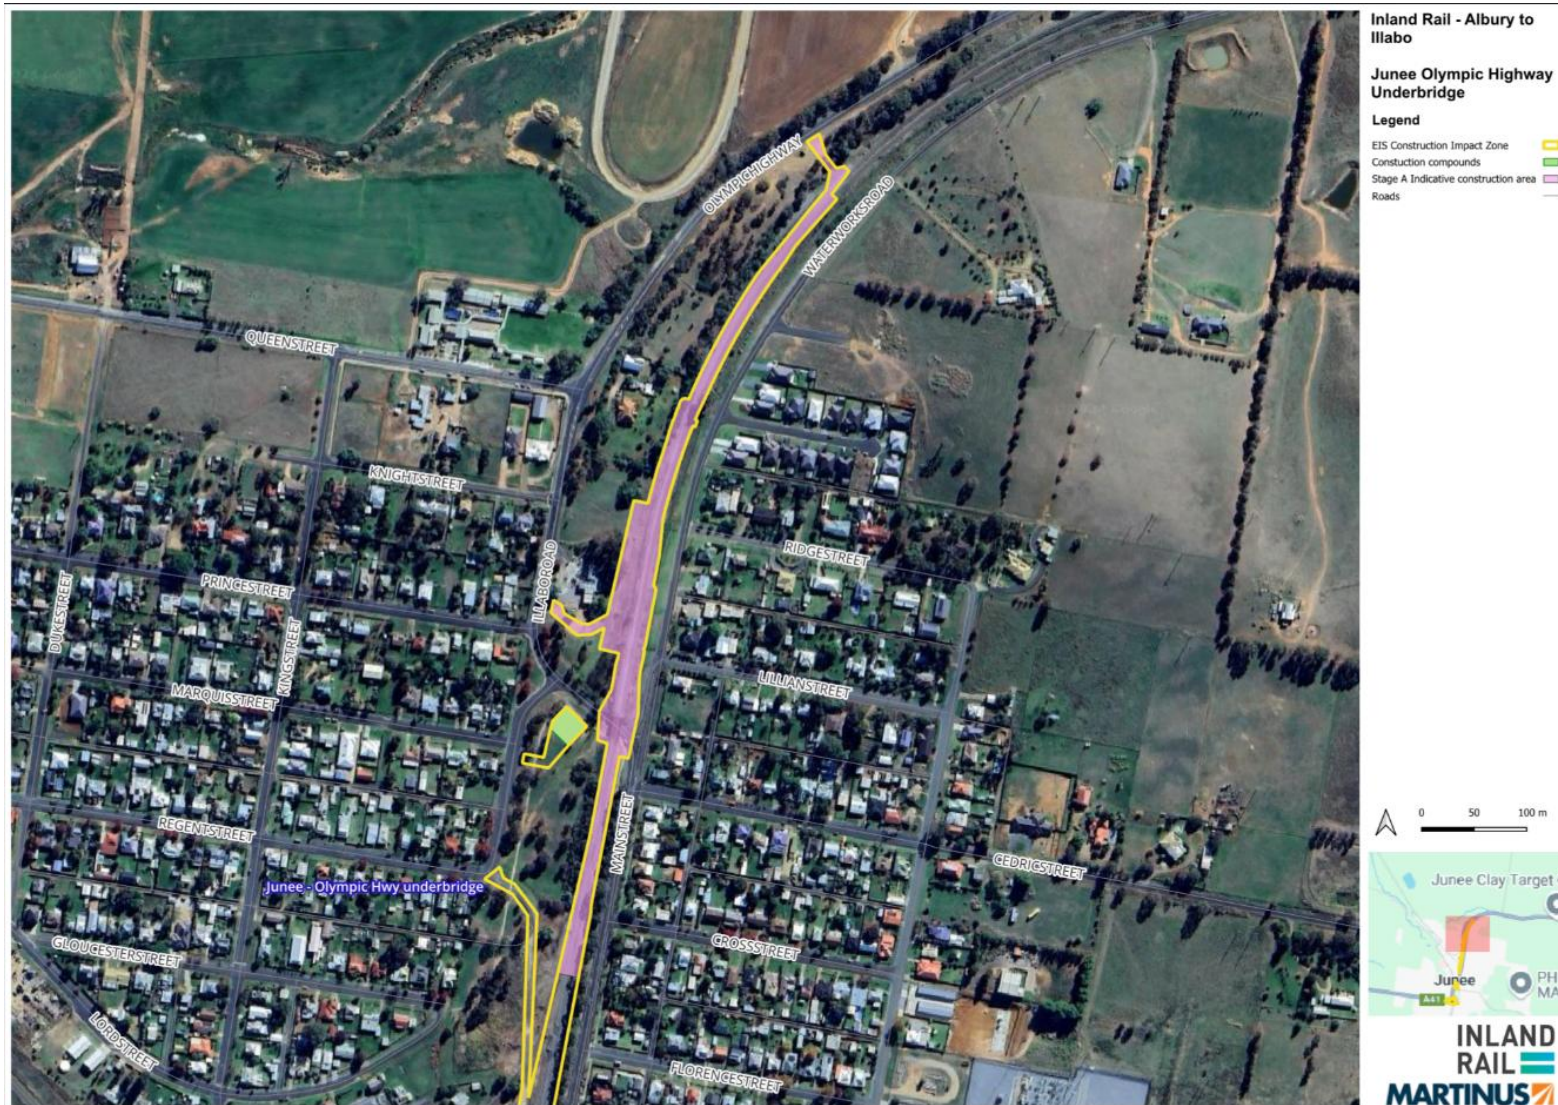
OLYMPIC HIGHWAY UNDERBRIDGE ENHANCEMENT SITE (2 OF 2) (STAGE A)
